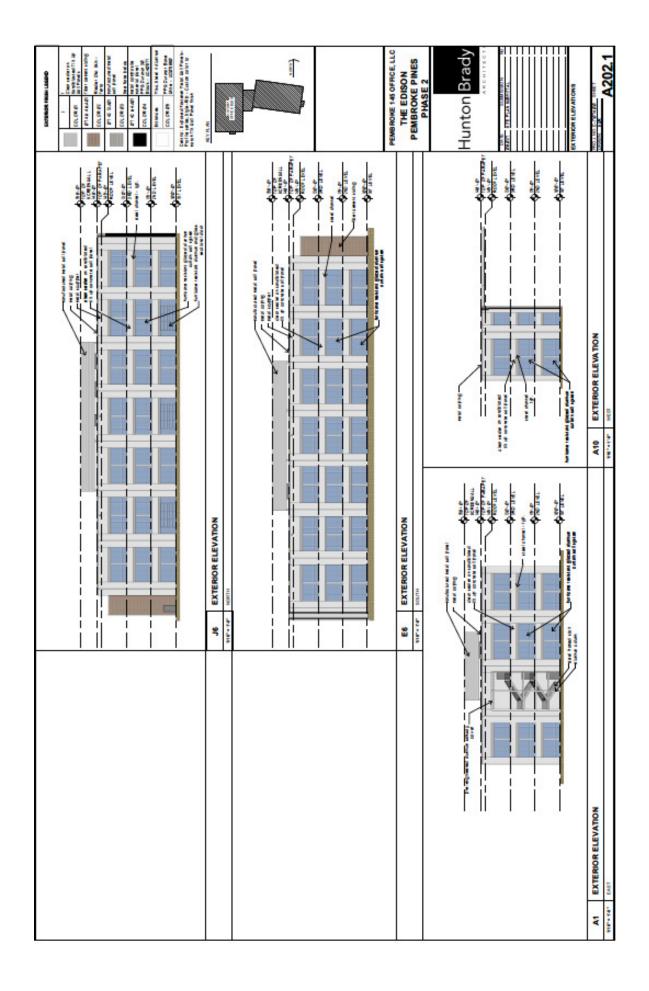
BUILDING ELEVATIONS PLAT A
